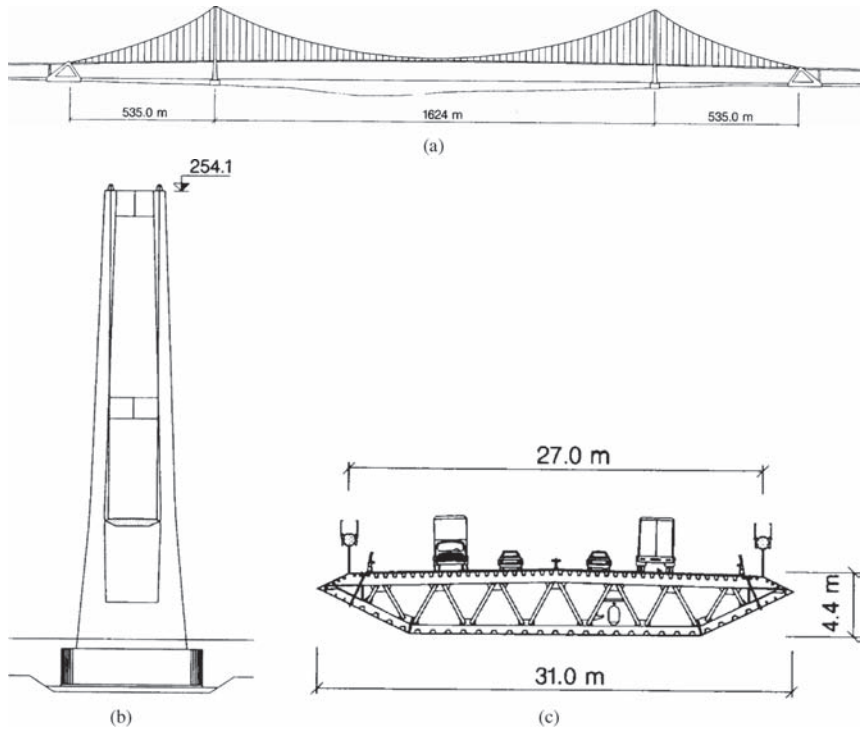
(a) Elevation of Great Belt Bridge, (b) Tower and (c) cross section of Great Belt Bridge.
